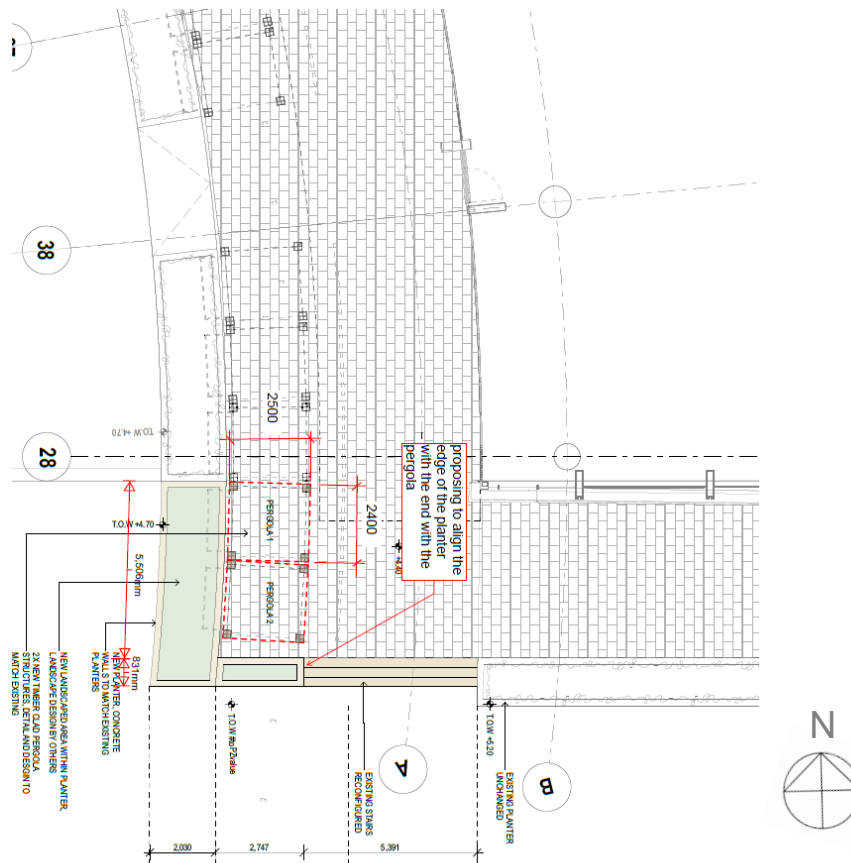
Proposed pergolas, landscape planter boxes and reconfigured stair under D/2020/134/B
